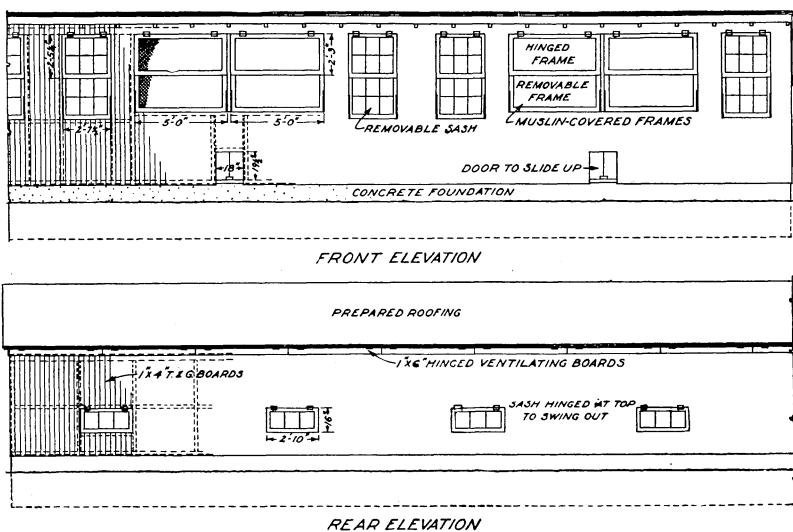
Front and rear elevation of one section of shed-roof laying house, 20 feet deep. (See figs. 17 and 18.)
